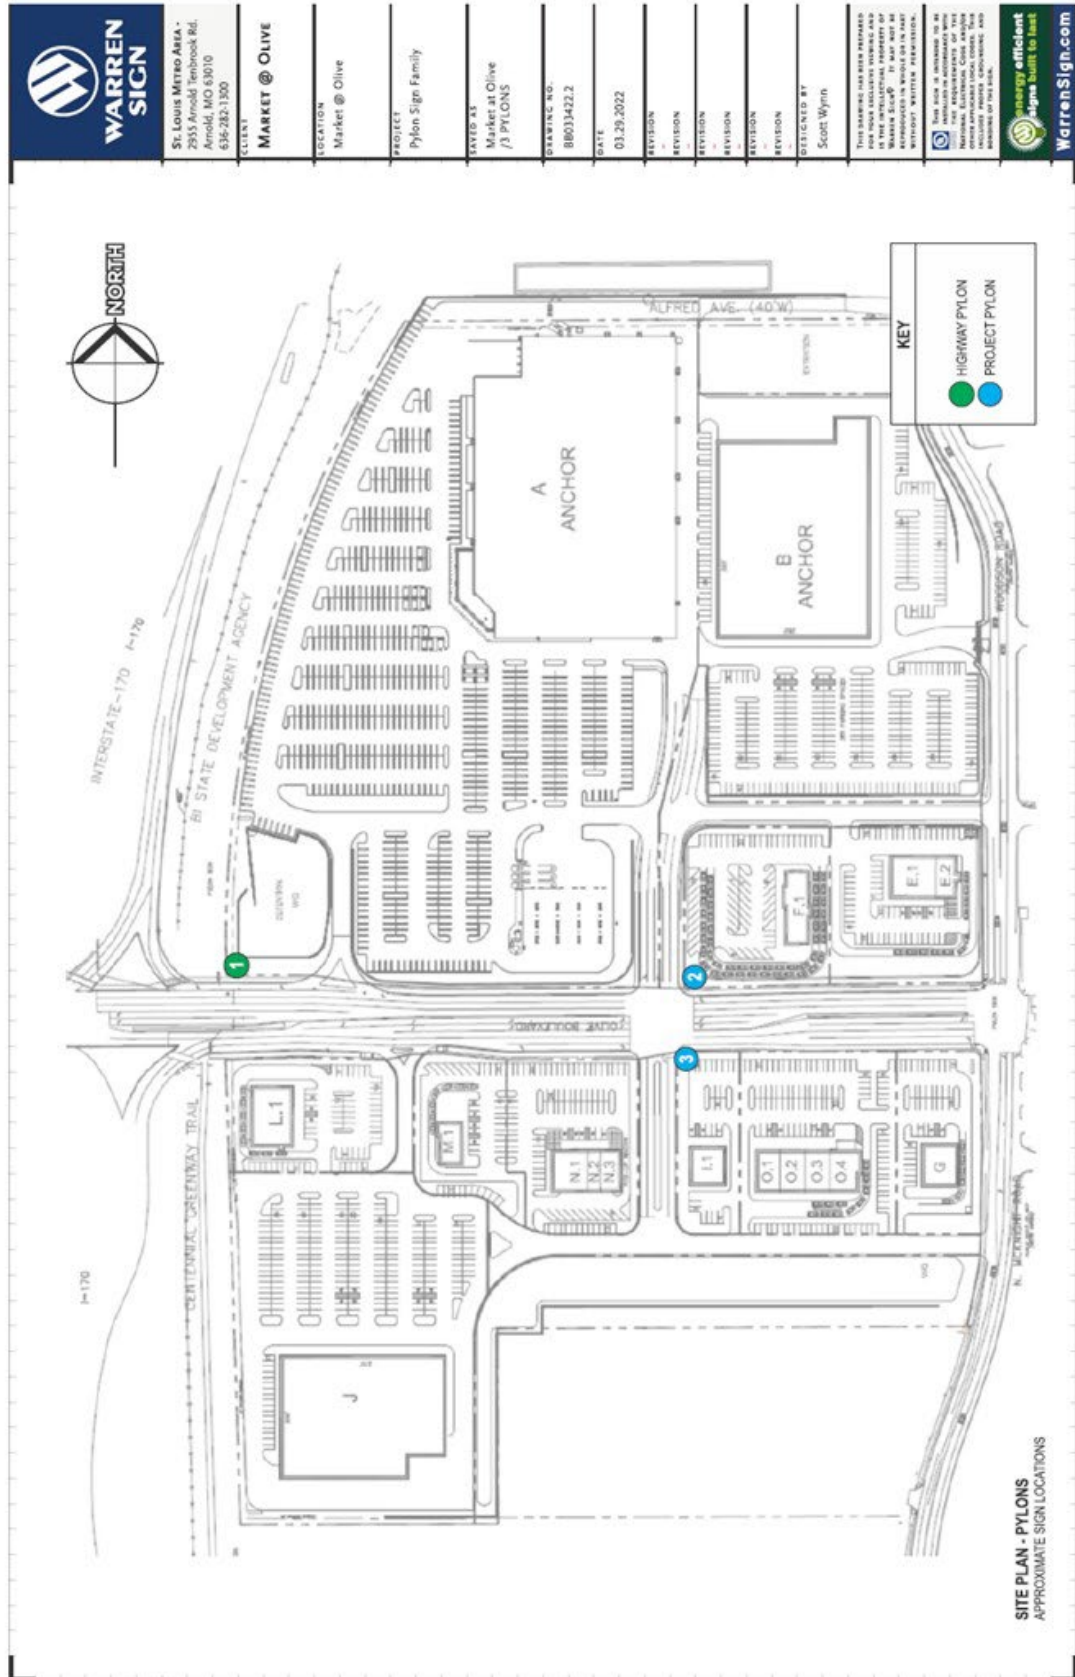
EXHIBIT B – COMPREHENSIVE SIGN PLAN
